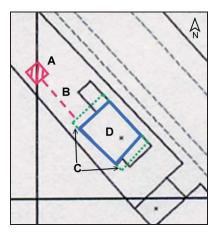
Plan of house (D), showing extensions (C), service trench (B) and klargester pit (A) (*scale 1:500*)
